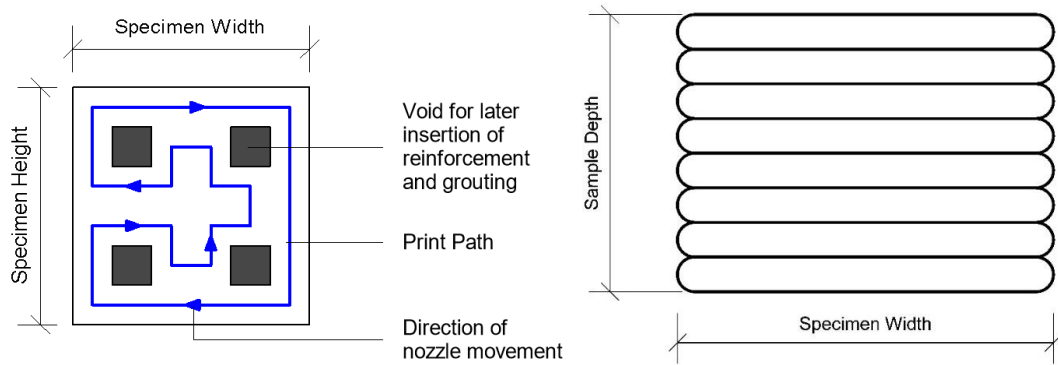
1) Cross section showing the different variables in a 3D printed concrete column. 2) Elevation view of a printed specimen
